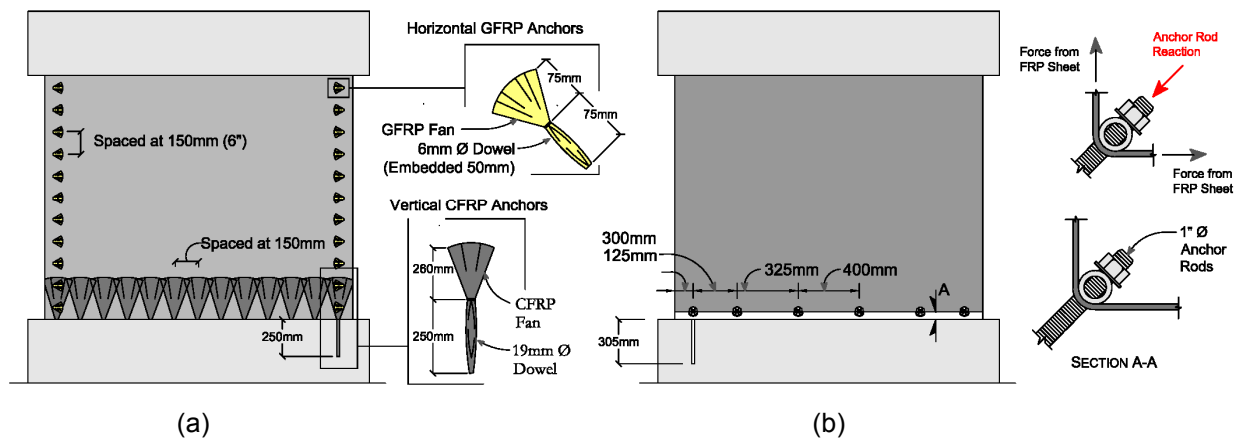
(a) CFRP and GFRP fan anchor system; (b) Steel tube anchor system
